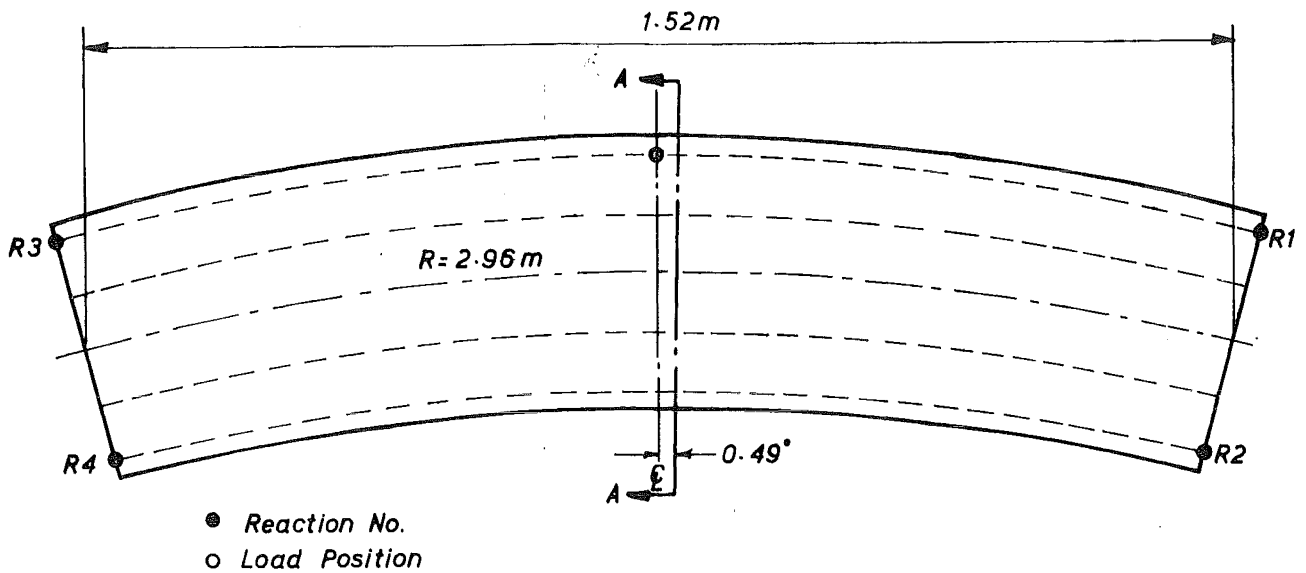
PLAN OF MODEL NO. 1
